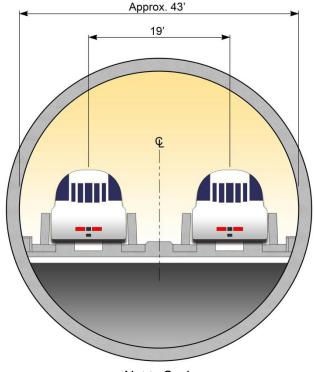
Typical Tunnel Cross Section for the Preliminary Alignments
